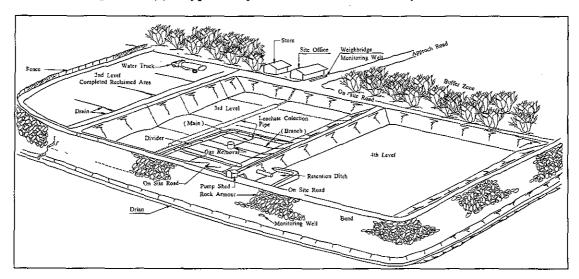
(b) Typical Layout for the Level 3 Sanitary Landfill
